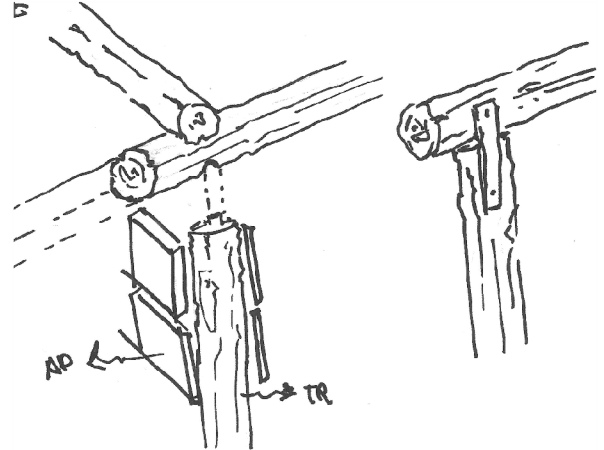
Construction of northeastern columns in the guest room on the first floor; (a) in pillars with less thickness, mud-brick rubbles are employed along with mud-straw mortar in place of square mud-bricks.
